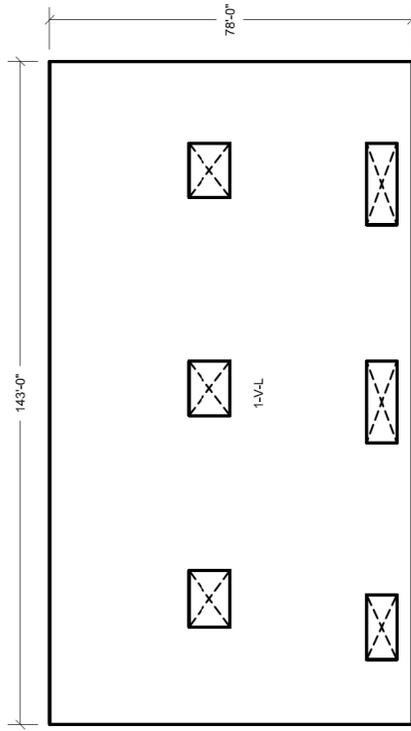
H.6-128: PUMP HOUSE FLOOR EL. 15'-2"
